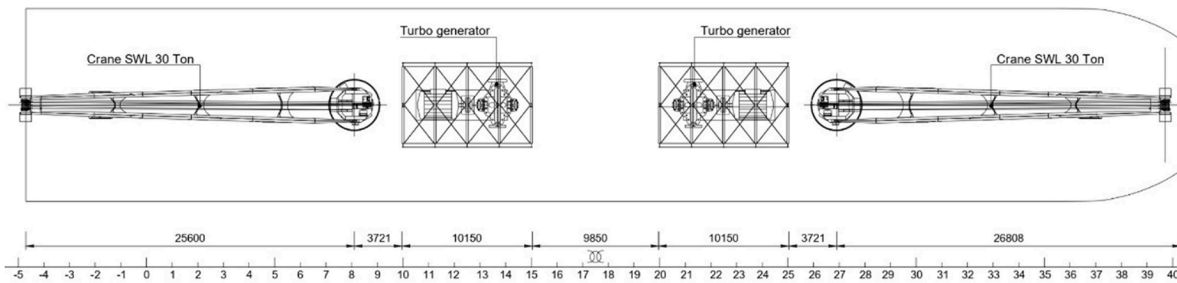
Plan View Prototype Floating Barge OTEC 9000 mm.
